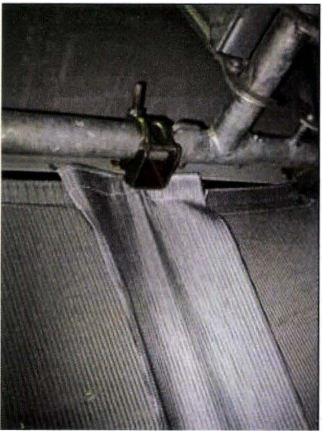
A small piece of sheet fixed onto plastic sheets to add strength.
